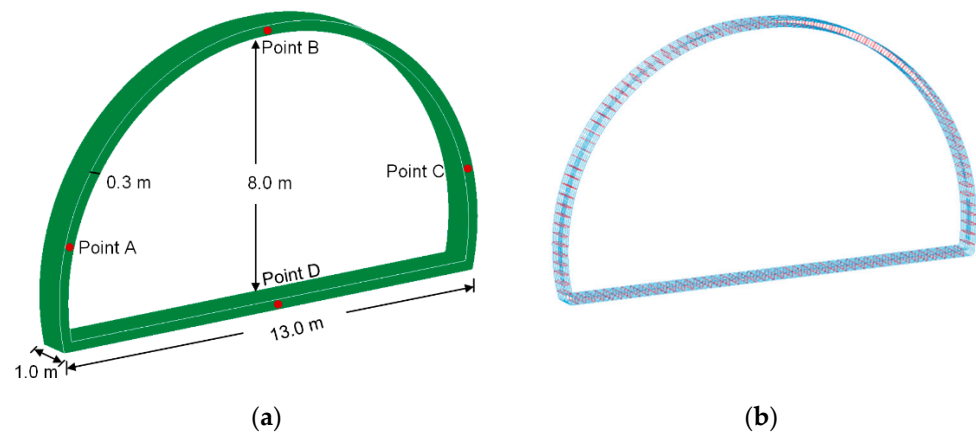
Finite element model of concrete and steel rebars: (a) concrete and (b) steel rebars.
